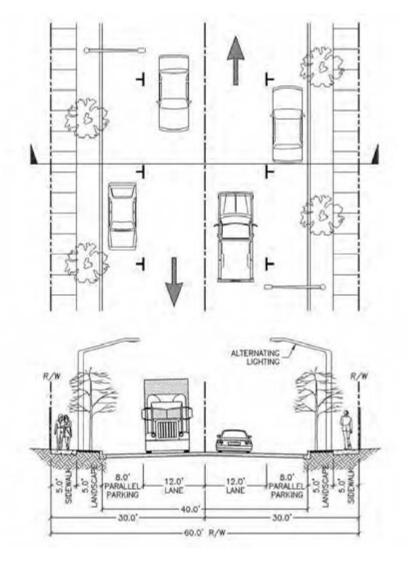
Typical 60' Right-of-Way Plan/Section
